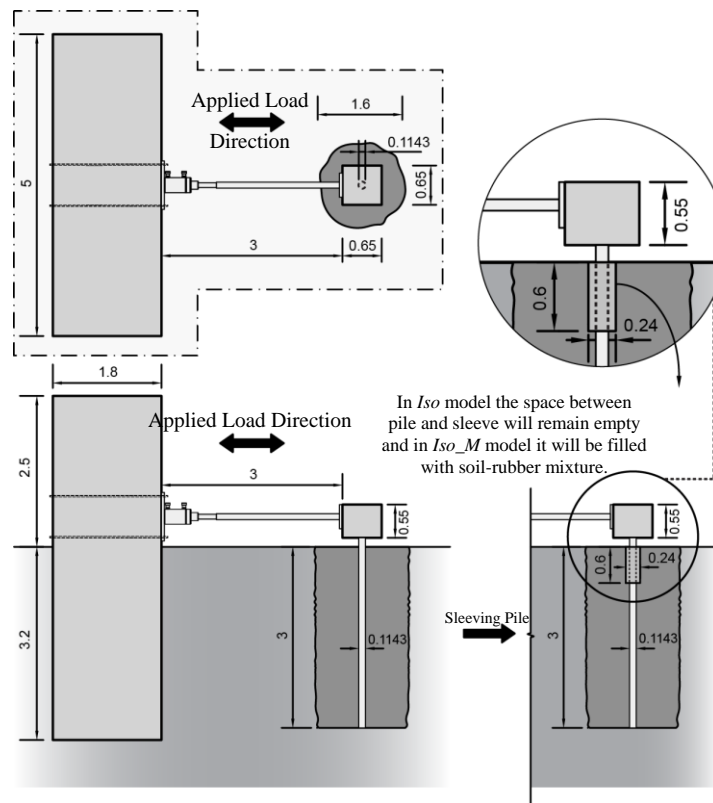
Test Arrangement and Dimensions for Con, Iso and Iso_M Models (Dimensions according to m)
